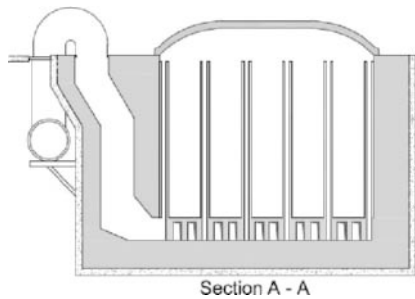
Cross sectional view of the Riedhammer design furnace #3 section from 1970. Section with 5 pits, exhaust manifold is connected to the exhaust outlet.
